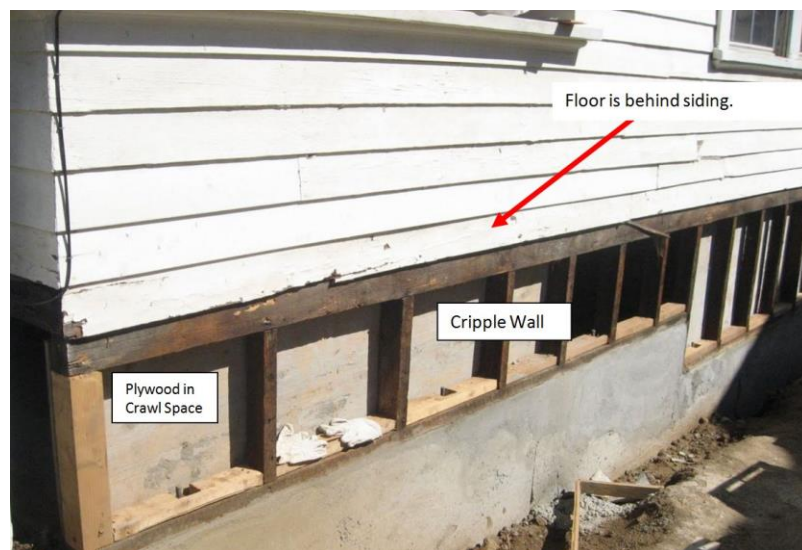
Example of a cripple wall on an old wooden house. The left end of the cripple wall has been retrofitted with plywood that resists shearing that is parallel to the wall. The solid wooden floor is strong and rigid and it ensures that there is no weak direction as long (as all the cripple walls are retrofitted).
